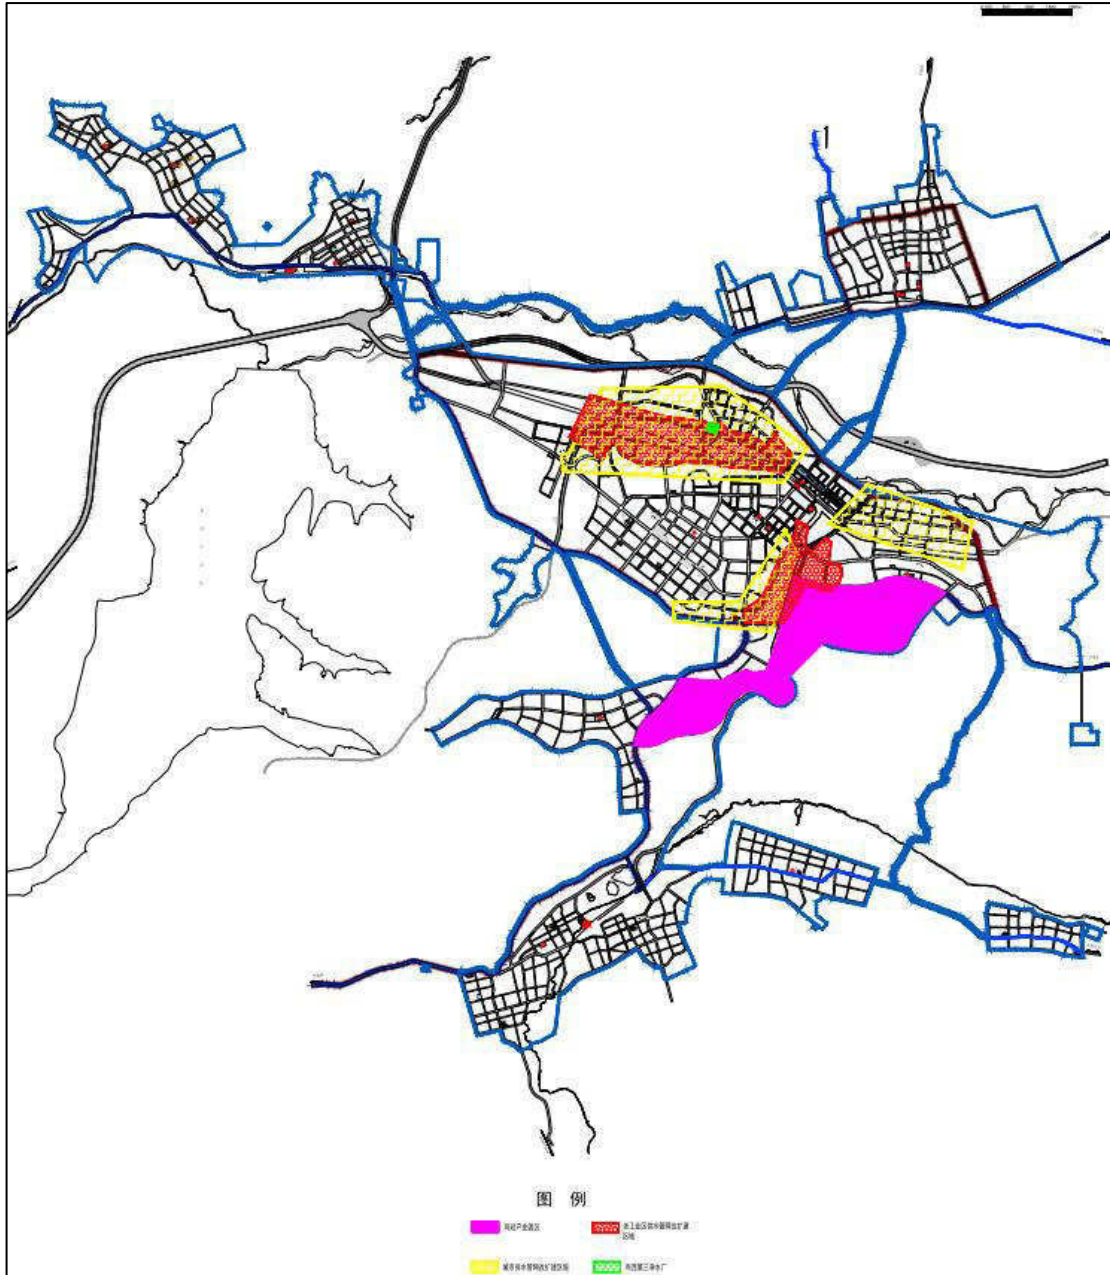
Proposed layout plan of sewer and drainage pipelines (JX)
